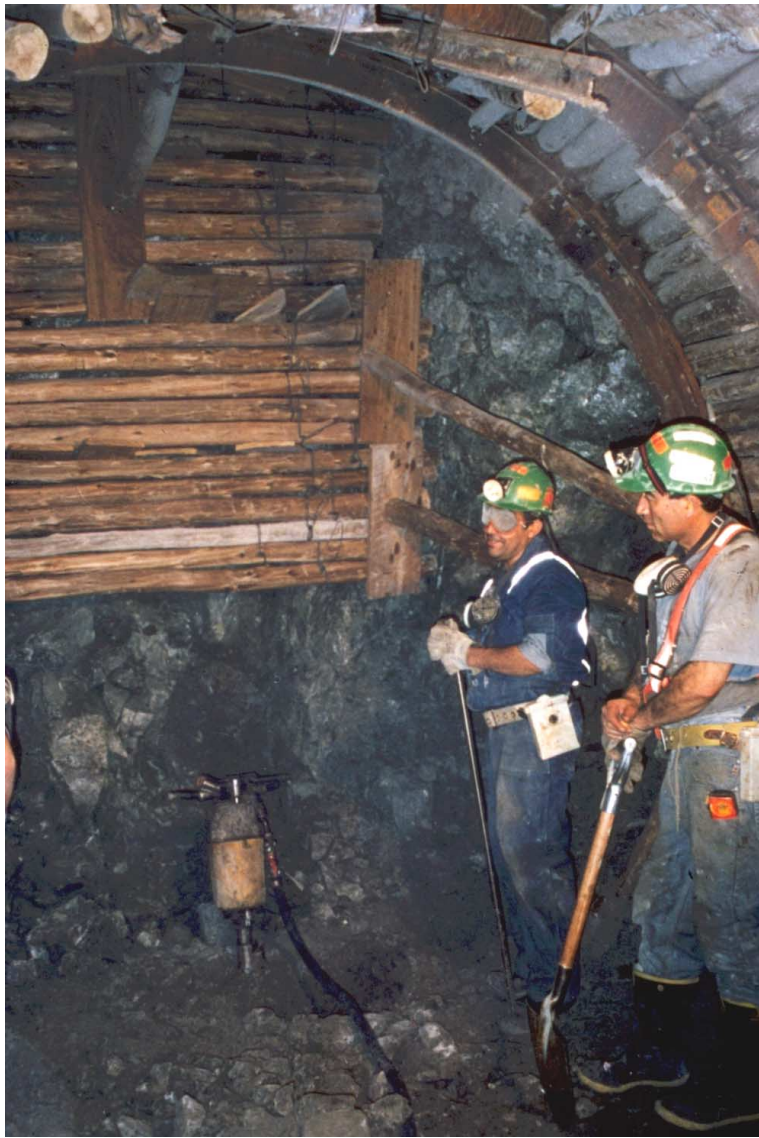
Installation of sliding joint top hat section steel sets immediately behind the face of a tunnel being advanced through very poor quality rock.
